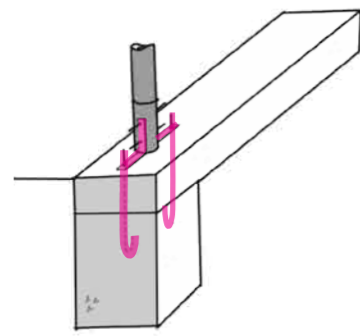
Pad footing with reinforced concrete plinth beam for bamboo post; threaded rods in concrete and angle bracket used to connect bamboo to beam.
